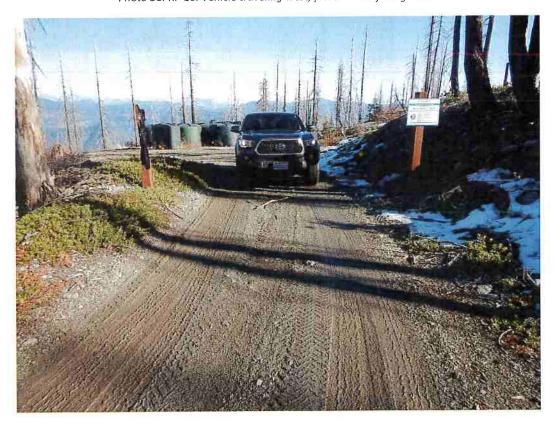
RP 16. Vehicle traveling west, photo taken facing east.
